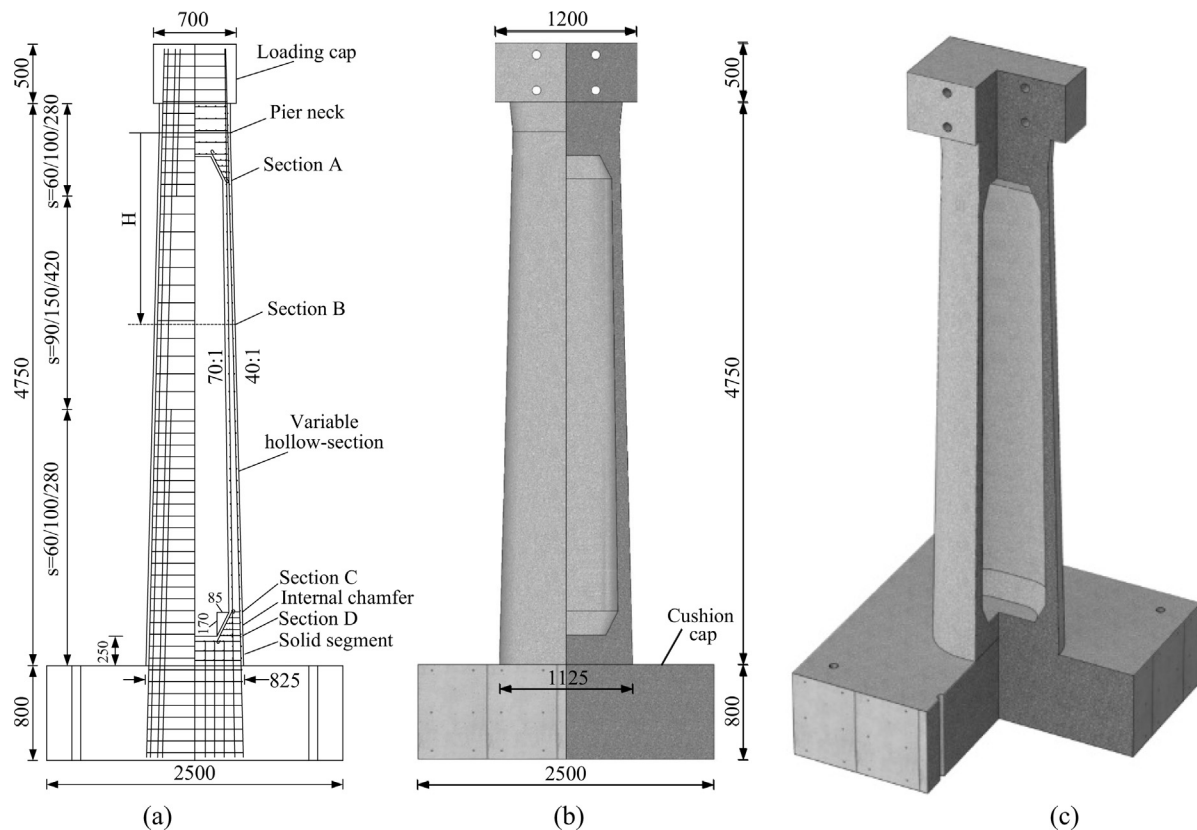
Details of the test specimen: (a) rebar arrangement in side view; (b) front view; and (c) 3D graph (unit: mm).
